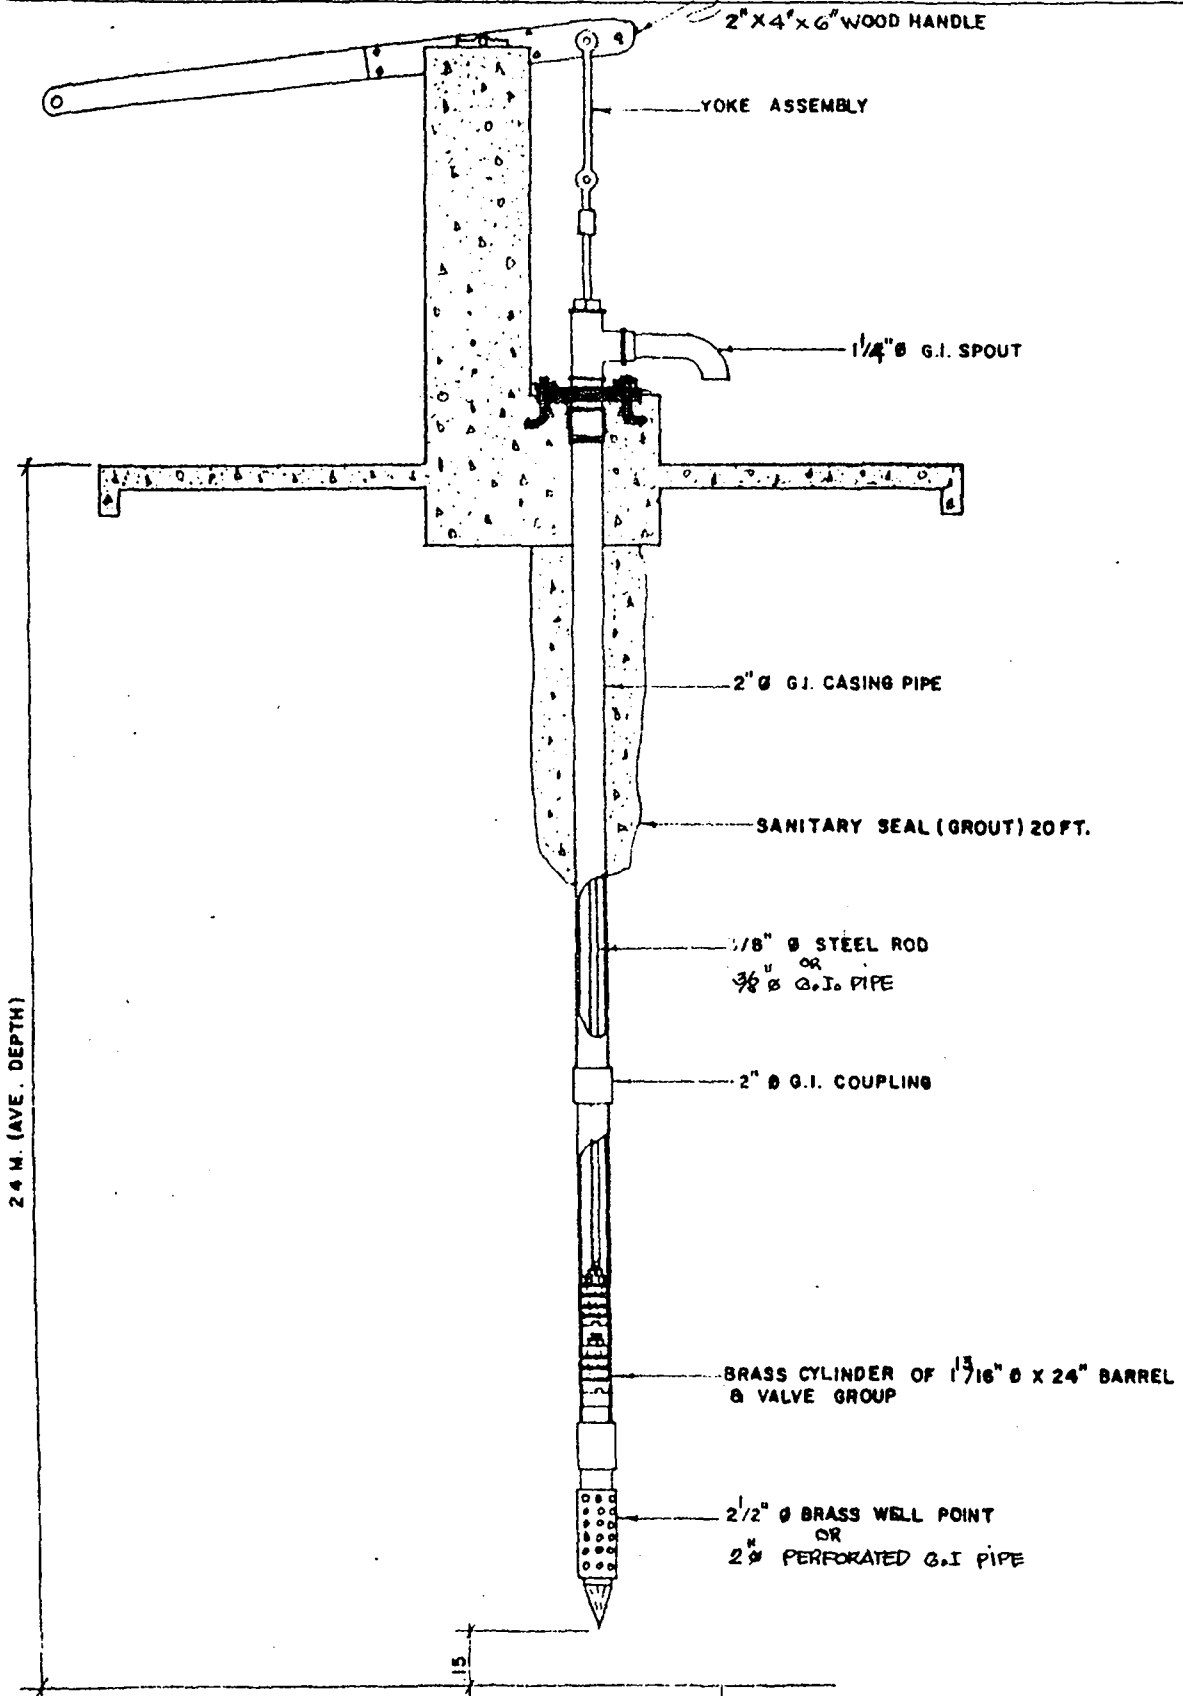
TYPICAL WATER PUMP SYSTEM
